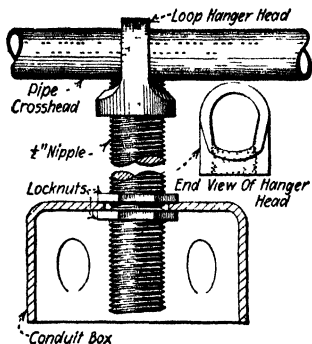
Thomas & Betts conduit-box hanger arranged for a heavy-fixture outlet.
